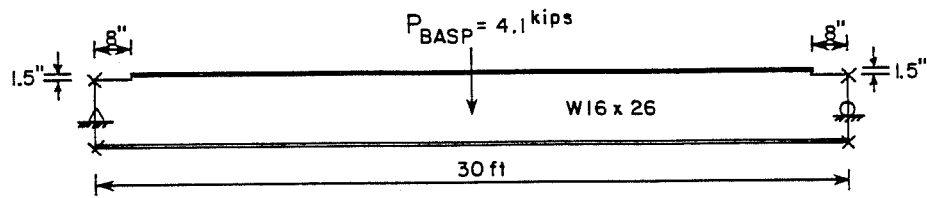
Buckled Shape of 30ft Top Flange Coped Beam
